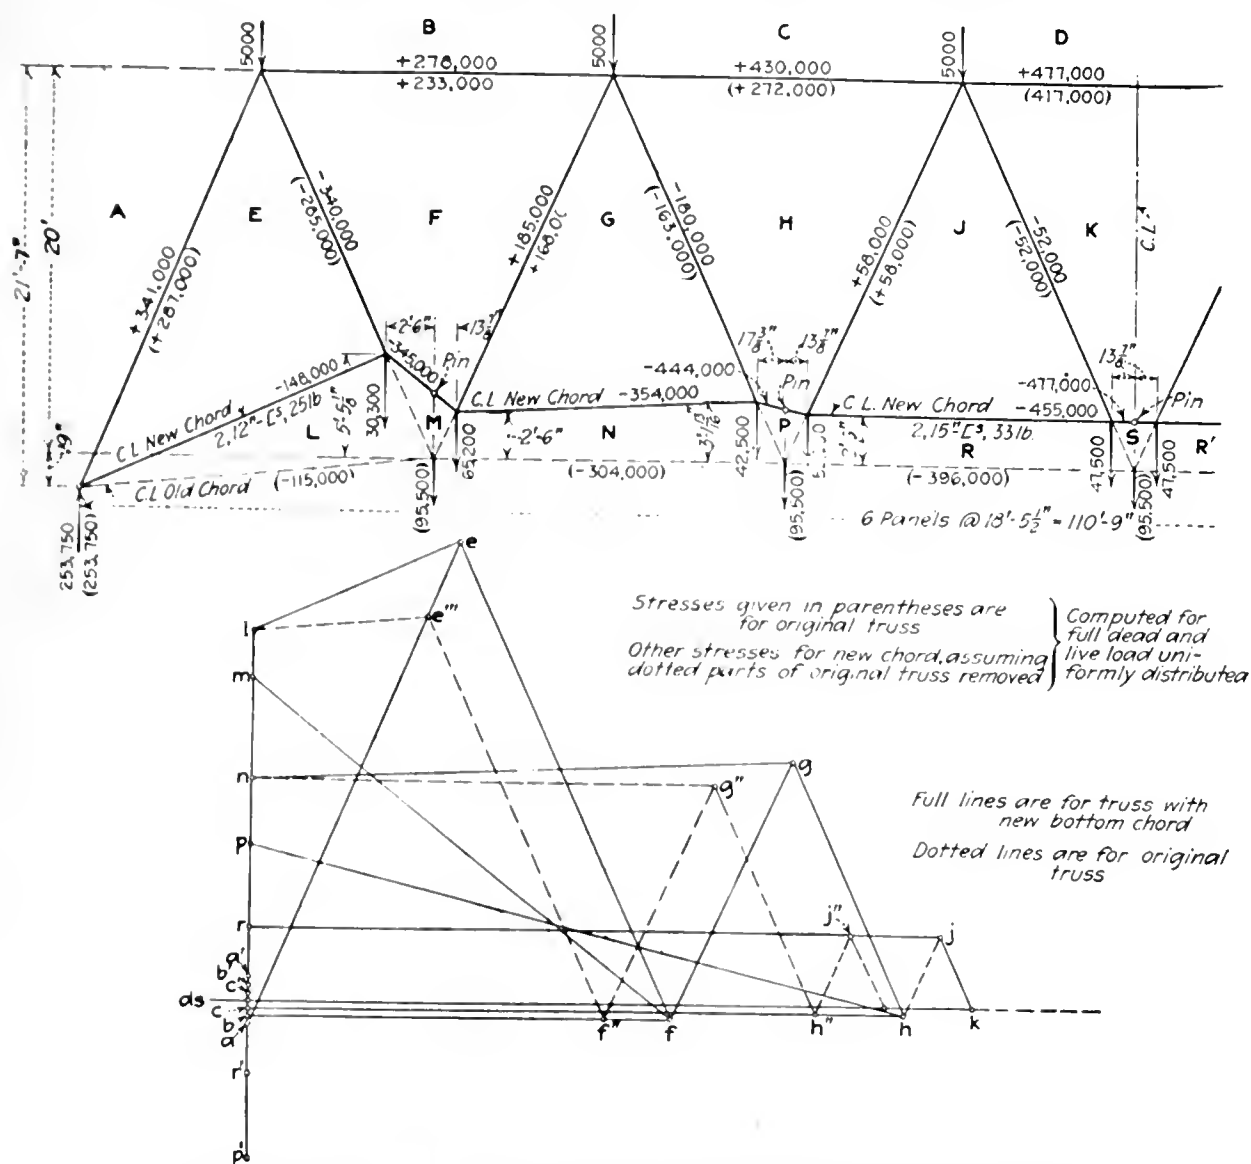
TRUSS DIAGRAM AND FORCE POLYGON FOR REINFORCED TRUSS—CHORD ALIGNED SO AS TO NEUTRALIZE ECCENTRICITY MOMENT
